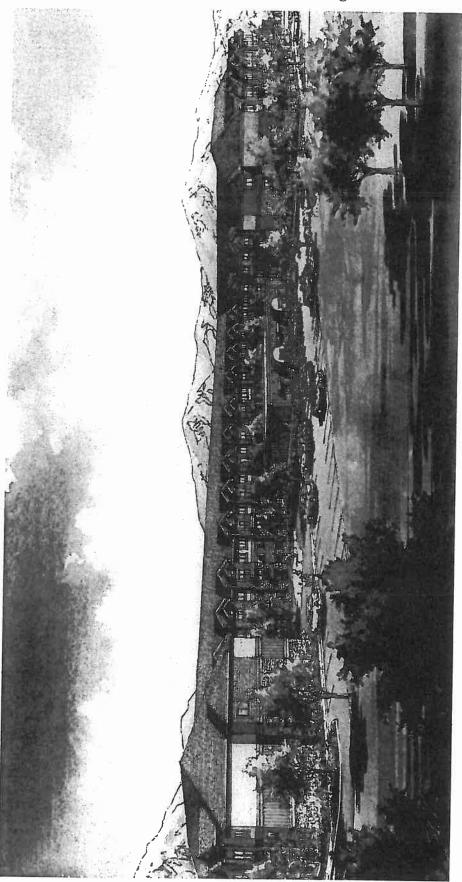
EXHIBIT "B" Concept Plan ADAMSWOOD STREET
